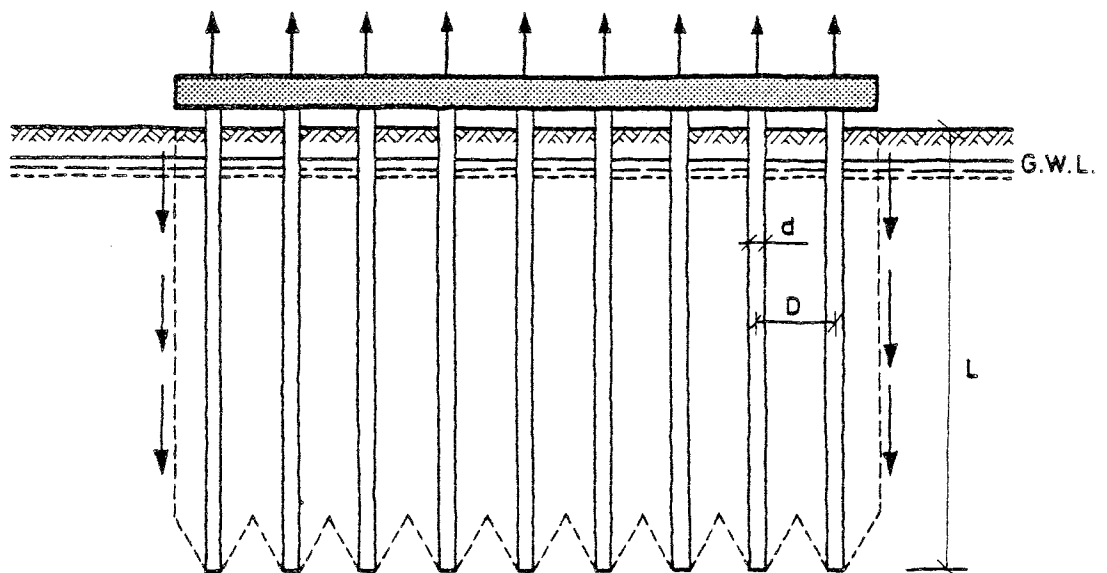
a. Group of Piles in Tension Failing by Uplift
